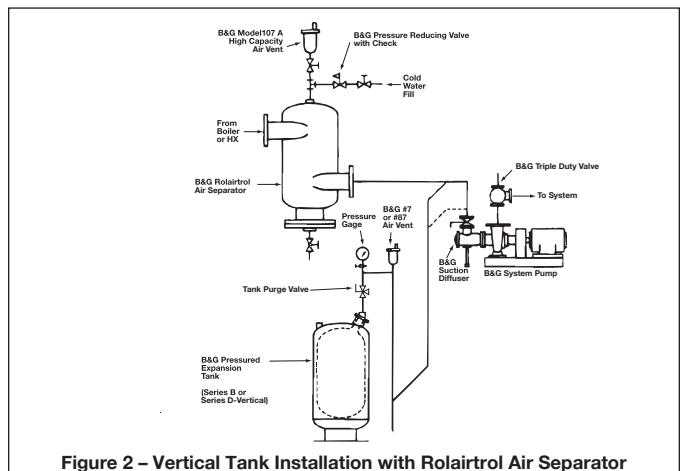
Vertical Tank Installation with Rolairtrol Air Separator
